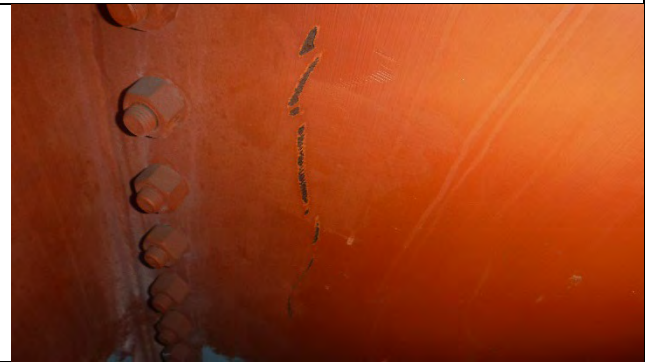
View of the West Face at Diaphragm A. Typical Example of Removed Knee Braces on Diaphragms, Looking West.
